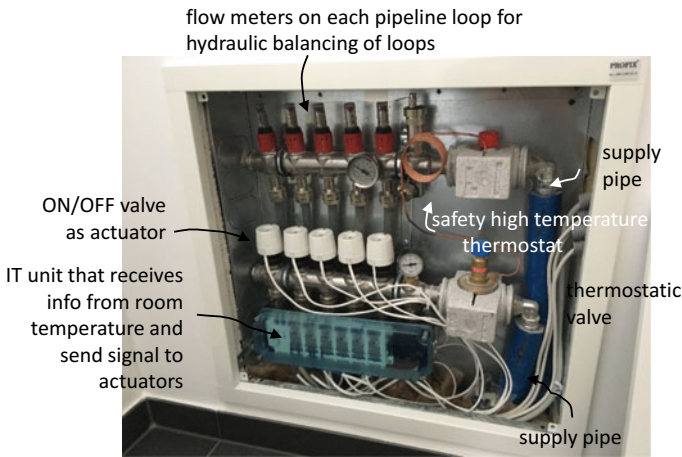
In each floor in a residential building or in each apartment in multifamily buildings, a junction box is installed
